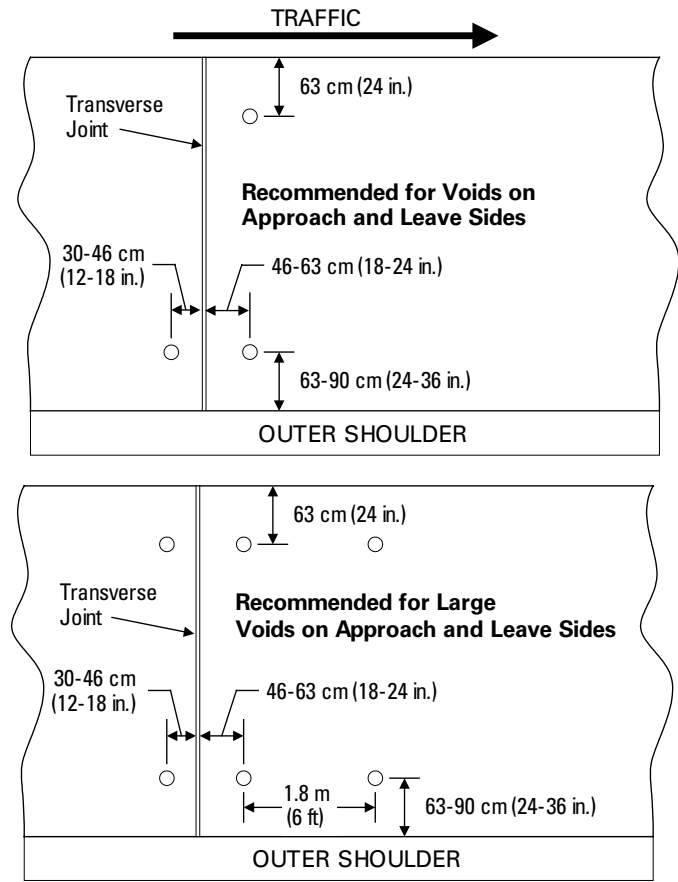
Typical hole patterns for jointed concrete pavements (Darter, Barenberg, and Yrjanson 1985)
